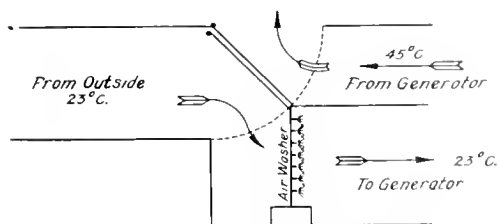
Arrangement of Dampers Taking Air from and Discharging it to the Outside
